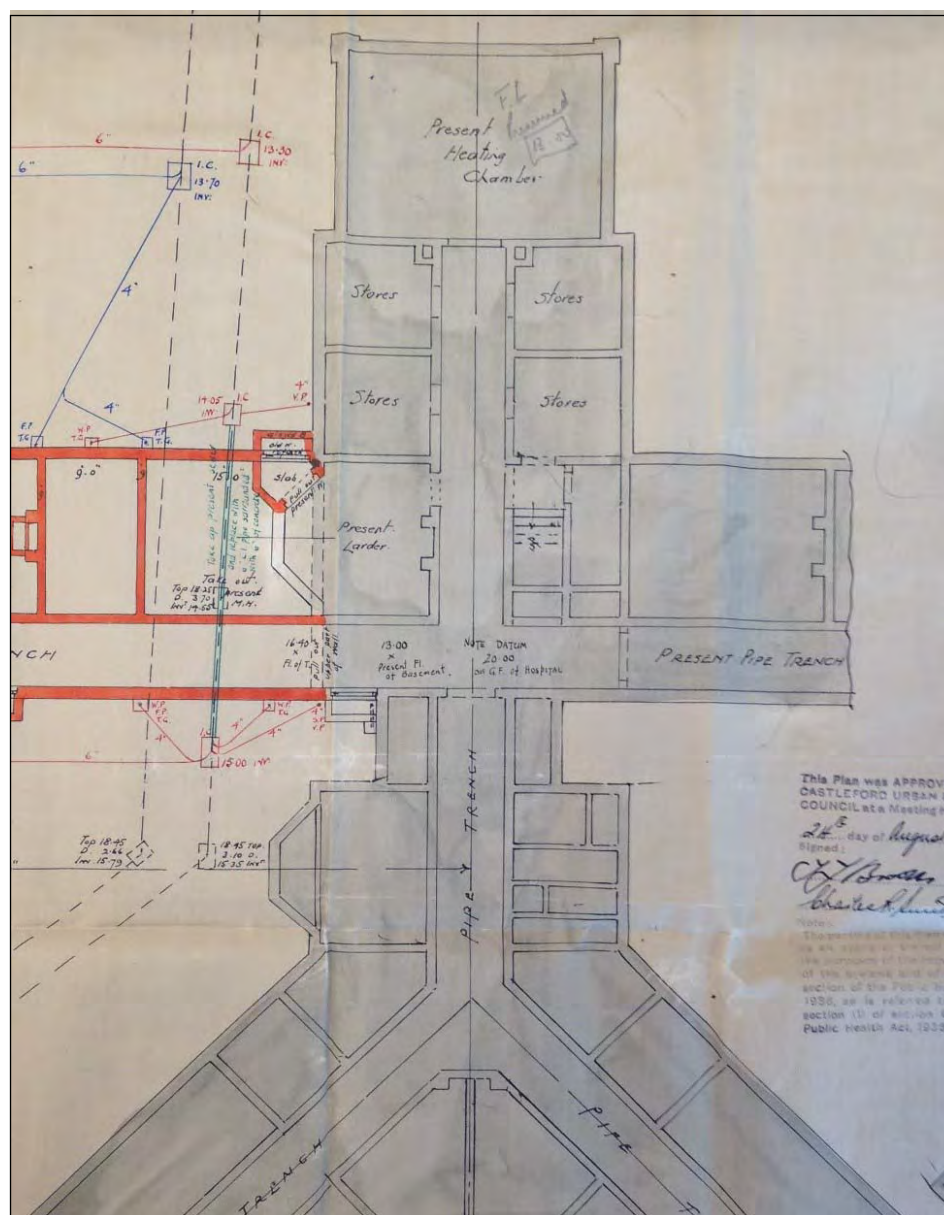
West wing of original building at basement level (WYAS: Wakefield WMT/CA/4171, plan 3).
